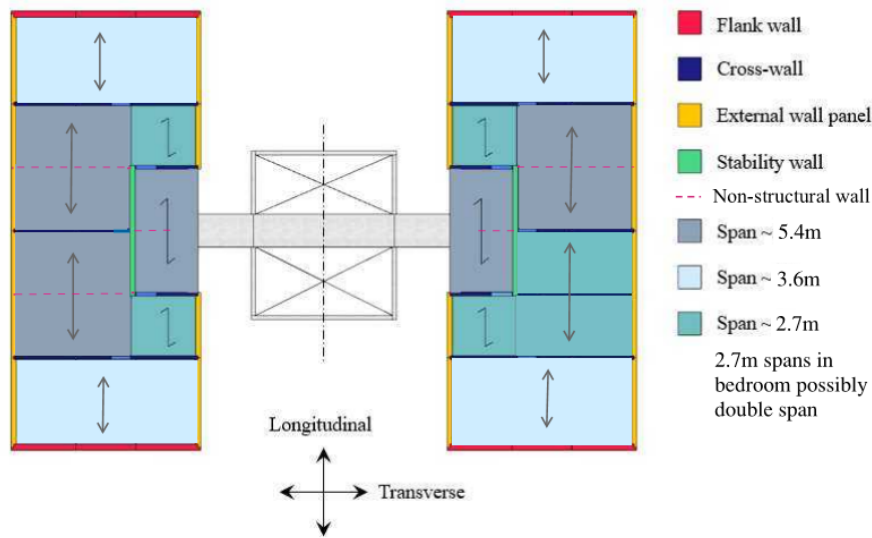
Approximate floorplan of each block, illustrating the clear span dimensions..
